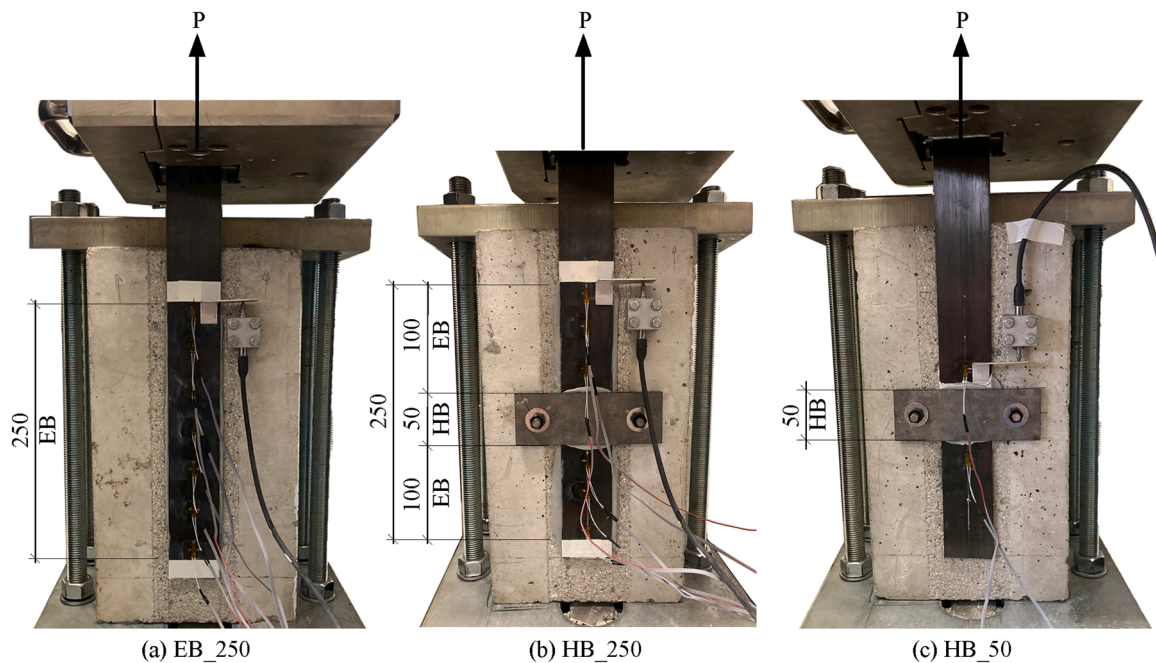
Single-shear test specimens (a) EB-250, (b) HB-250 and (c) HB-50 (dimensions in mm).
